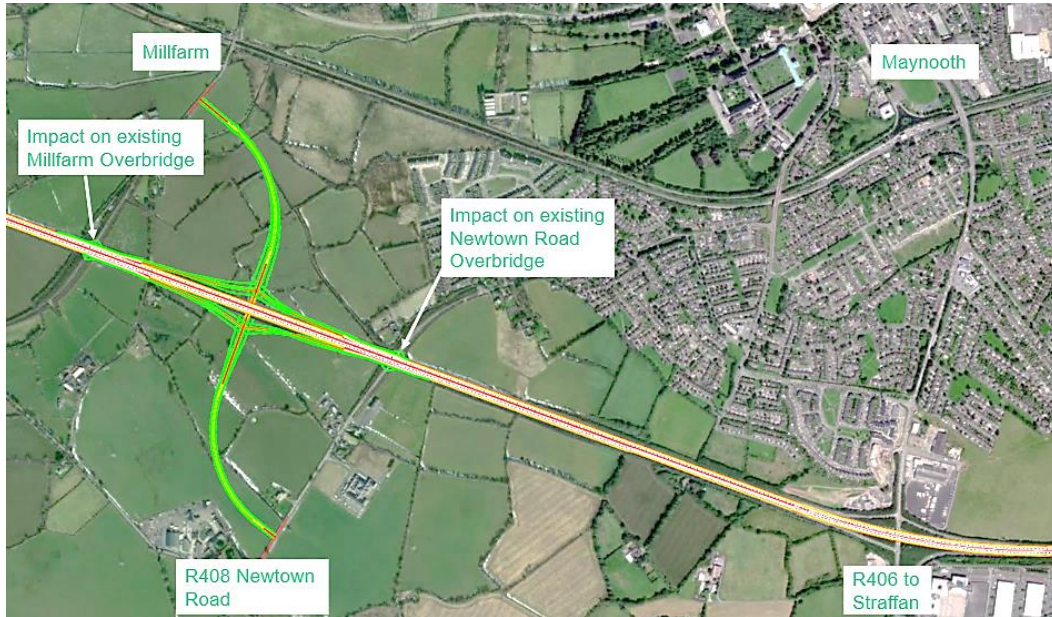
Location B - Junction between Millfarm and Newtown Road
